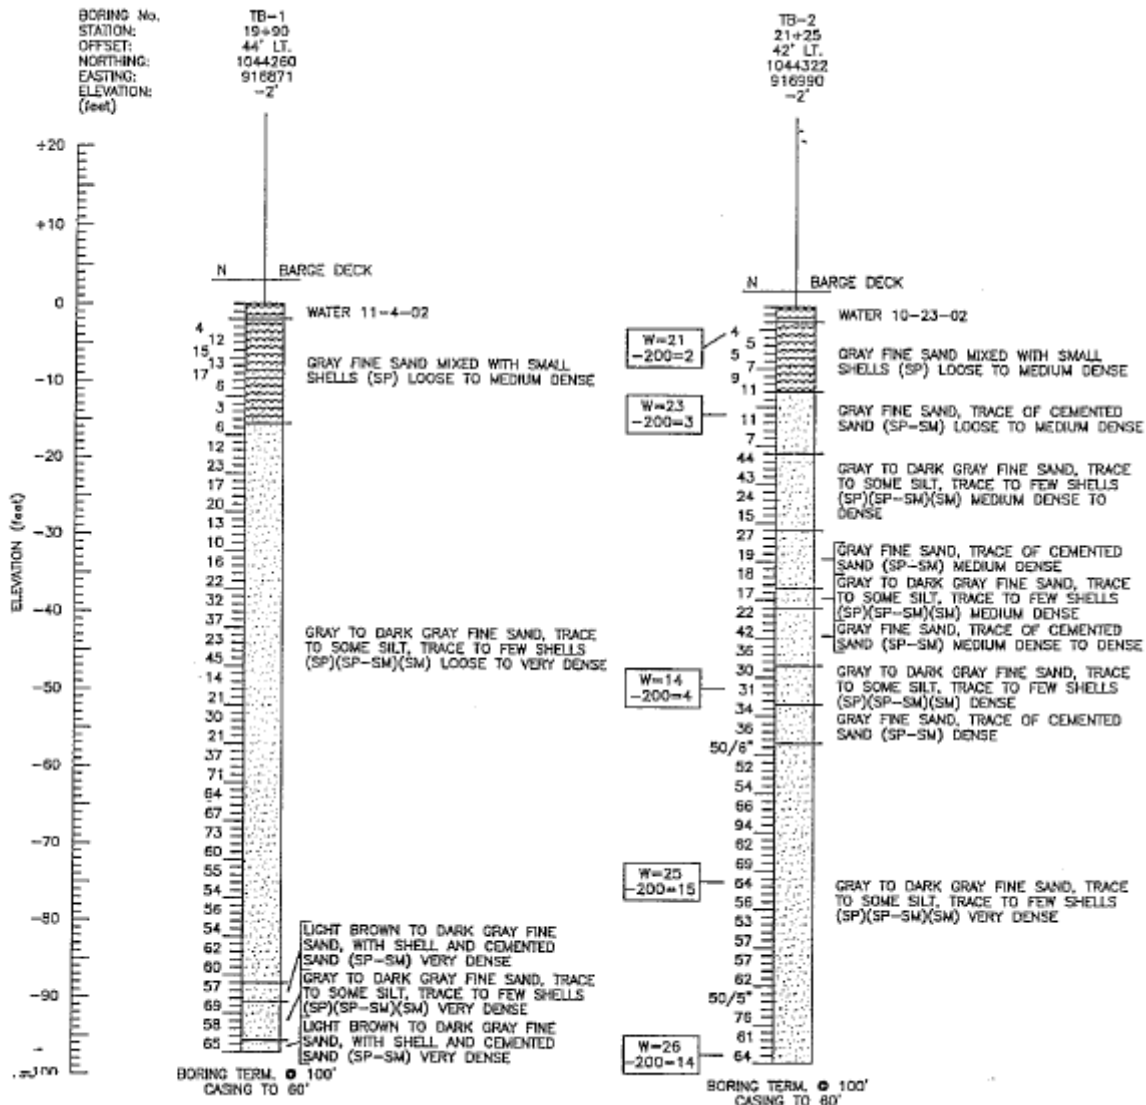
Borings "T-1" (left) and "T-2" (right) taken from bridge plans
